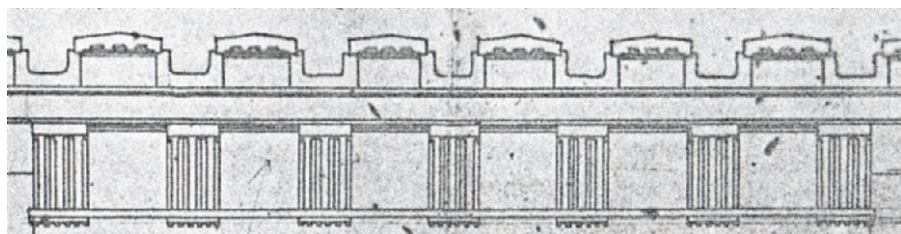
Temple of Apollo Epicurius at Bassai<sup>15</sup>. Cross section through the front porch showing U-shaped ceiling beams and coffer slabs.
